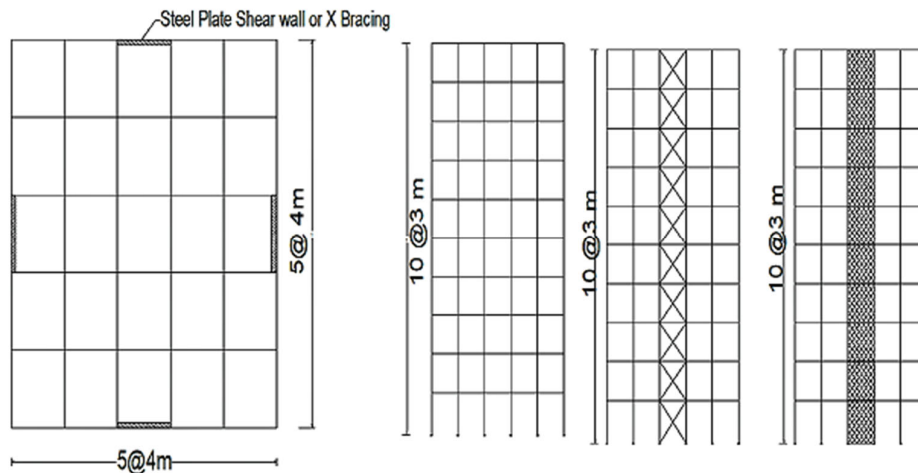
Plan and facade view of modeled frames in SAP2000 software
